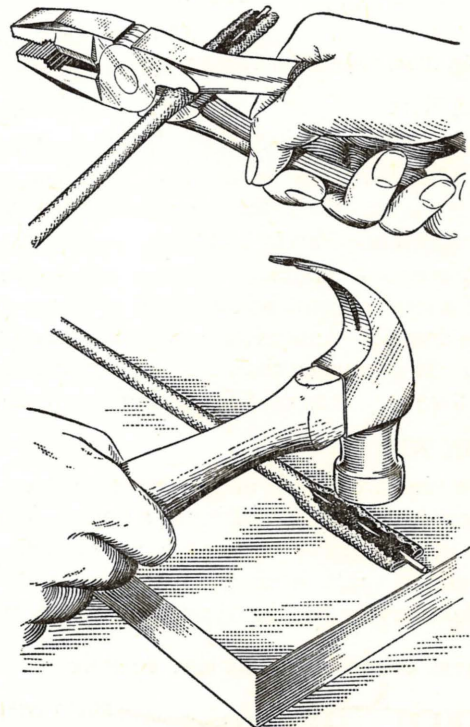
The insulation on solid or stranded wire may be crushed between the handles of a pair of side cutting electricians' pliers, or by pounding with a hammer. Be careful not to nick the wire.
